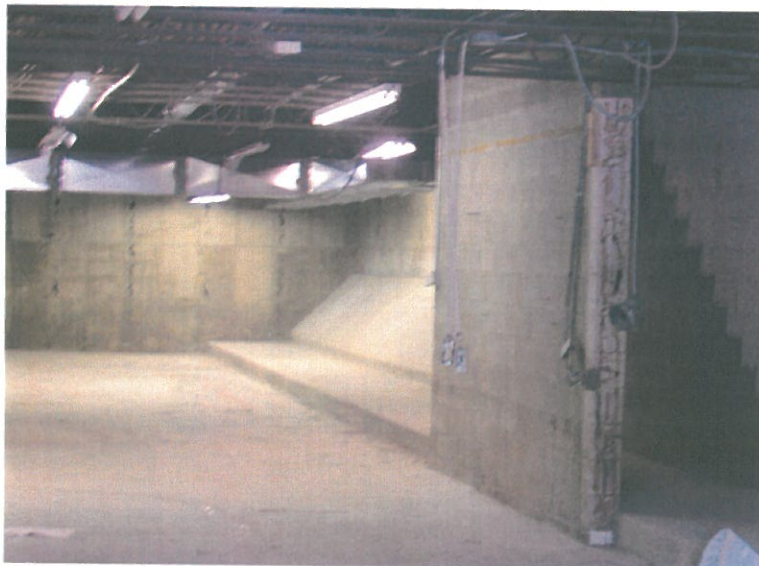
Former Ladner Hardware Lower Level Floodproofing
